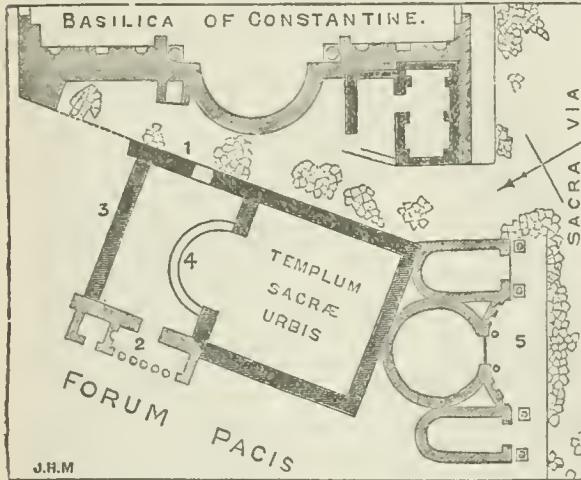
Group of buildings by the Forum Pacis. 1. Existing wall of peperino and tufa, with travertine doorway, 2. Do. and porch destroyed by Urban VIII. 3. Brick-faced wall of time of Severus against which the marble plan was fixed. 4. Apsè built by Felix IV., when he converted the Templum Sacre Urbis into the church of SS. Cosmo e Damiano. 5. Temple of Romulus, built by Maxentius, made by Felix IV. into the porch of his church.
